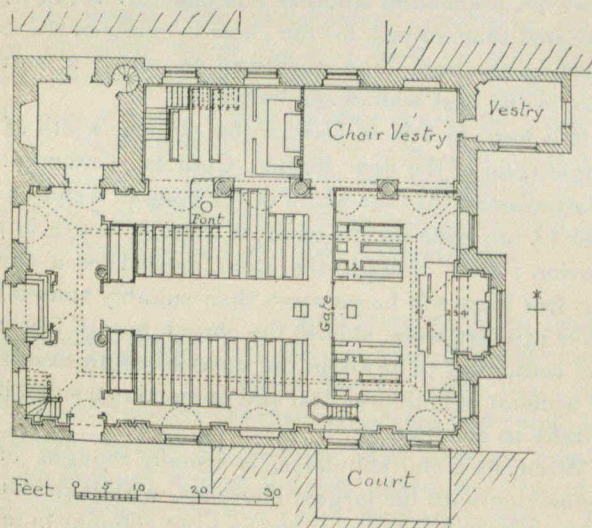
PLAN OF ST. MARGARET PATTENS.
